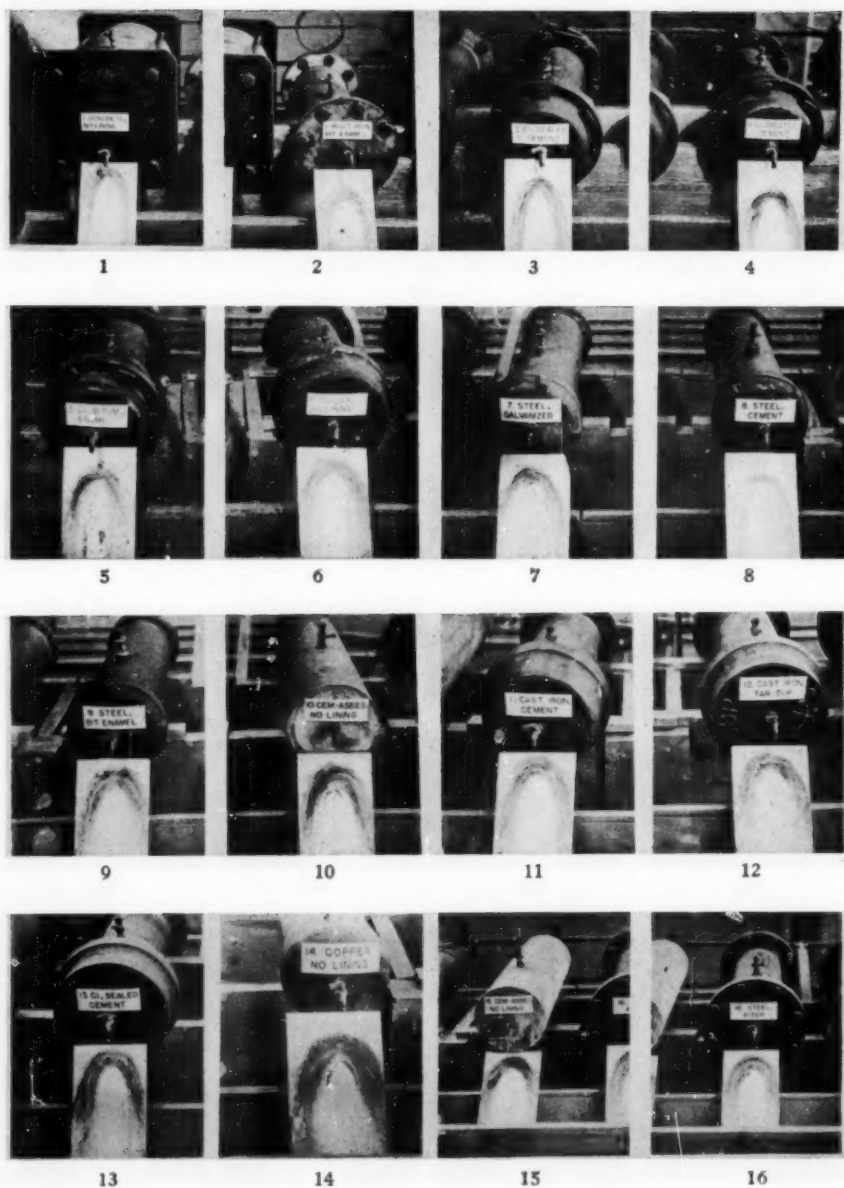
Staining of Plates in 6-in. Pipe Tests
